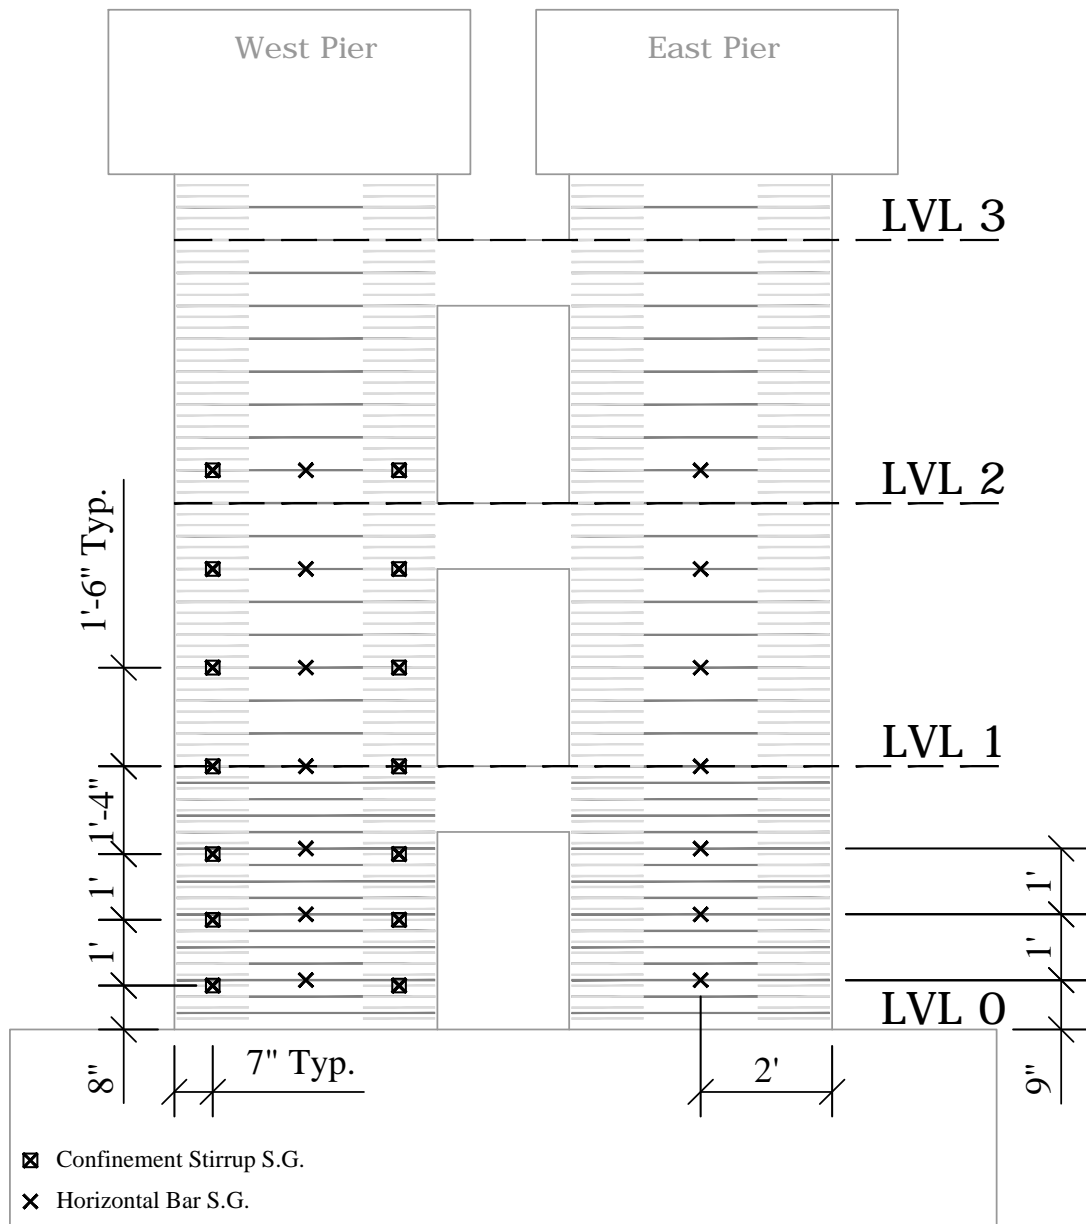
Horizontal bar and confinement stirrup strain gauge layout
